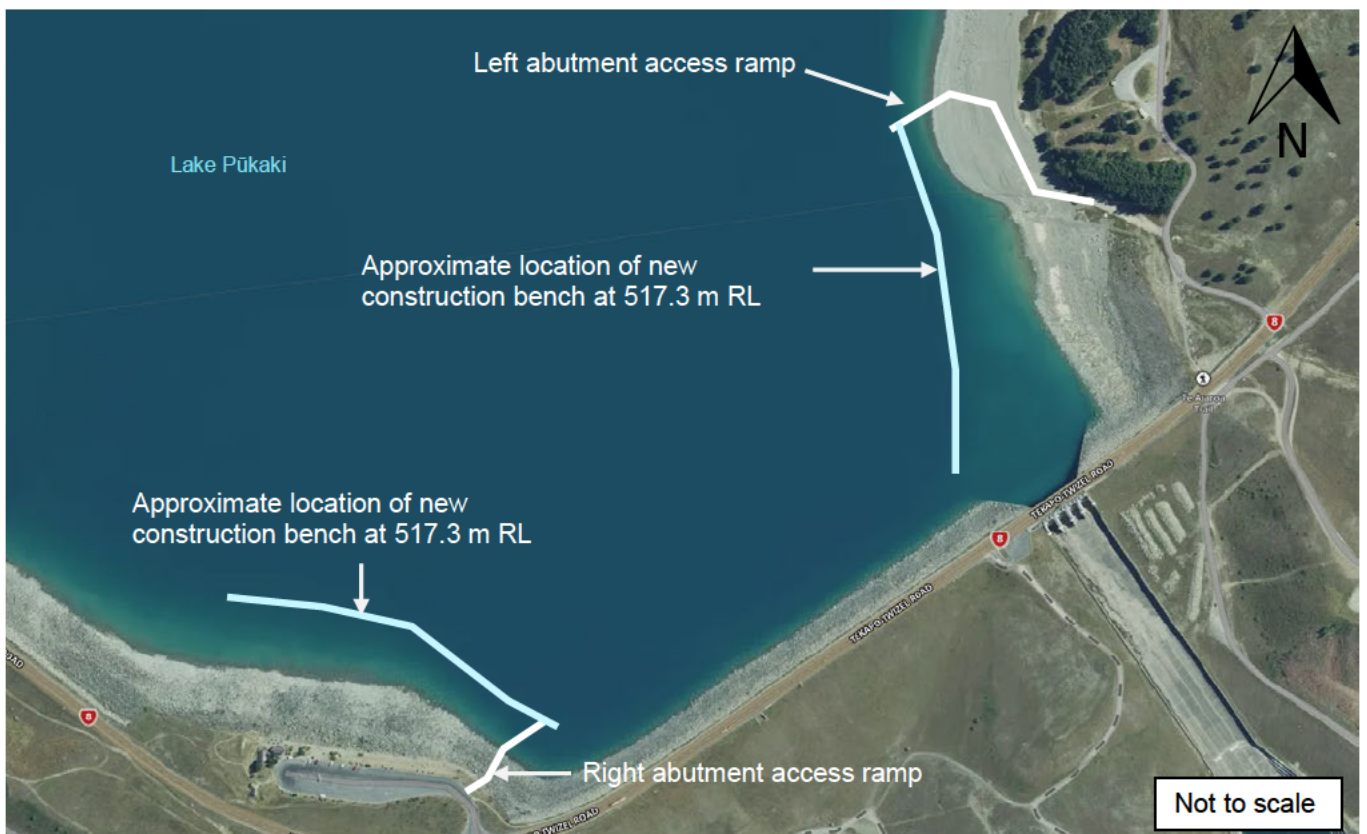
Site plan (abutments) – Tranche 1 - and indicative 517.3 m RL construction bench
